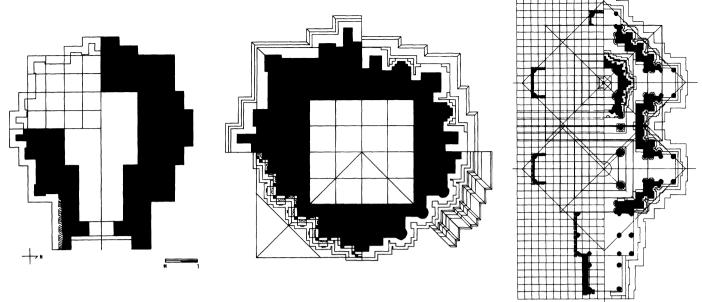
Siva temple, Mahua, Central India, ca. A.D. 775. Ground plan with constructing grid.
